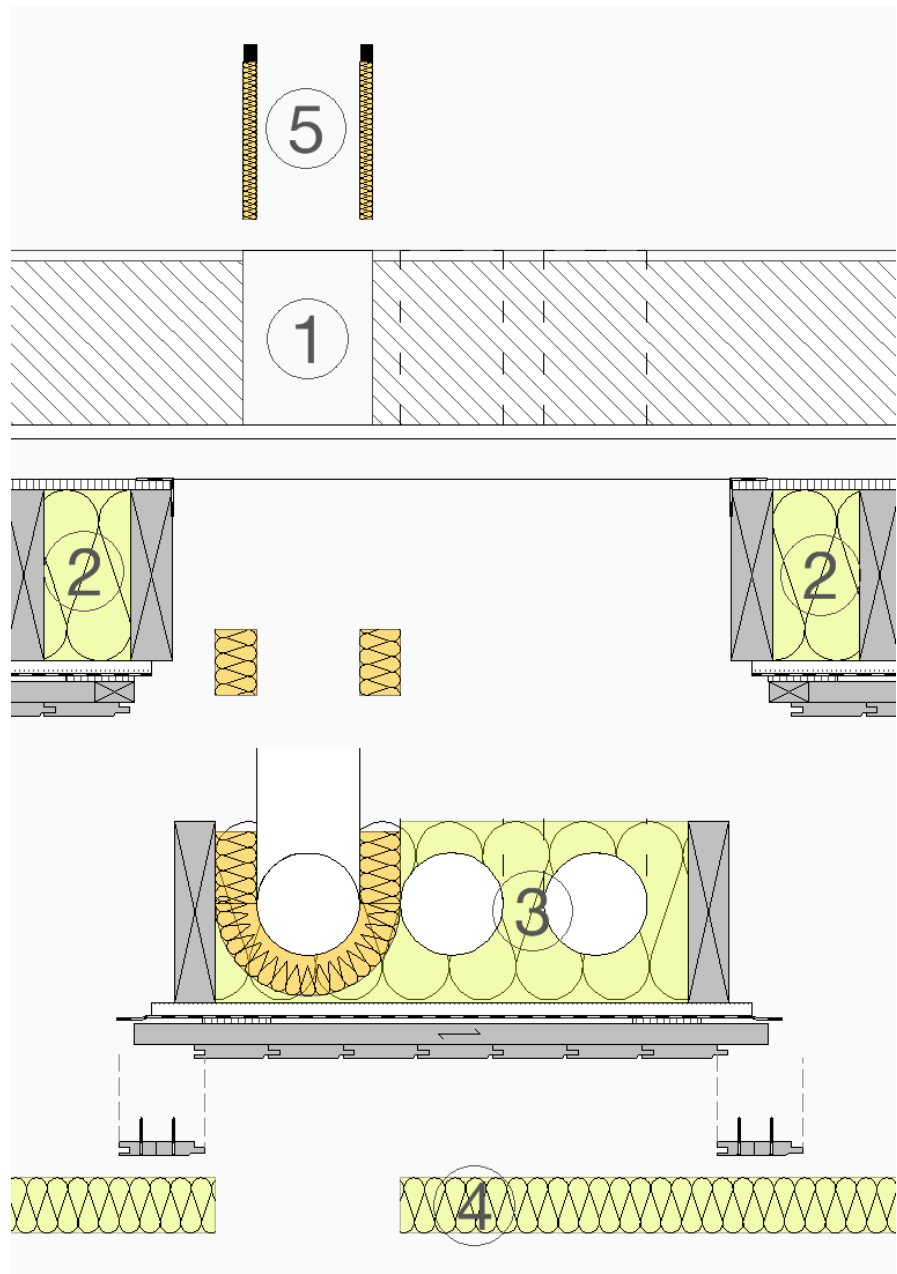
Assembly process of TES-connected element with HVAC ductwork. (1) wall opening (2) TES elements (3) TES shaft and connection (4) adaption layer blown in cellulose fibre (5) mortar filling and insulation remaining wall opening.
